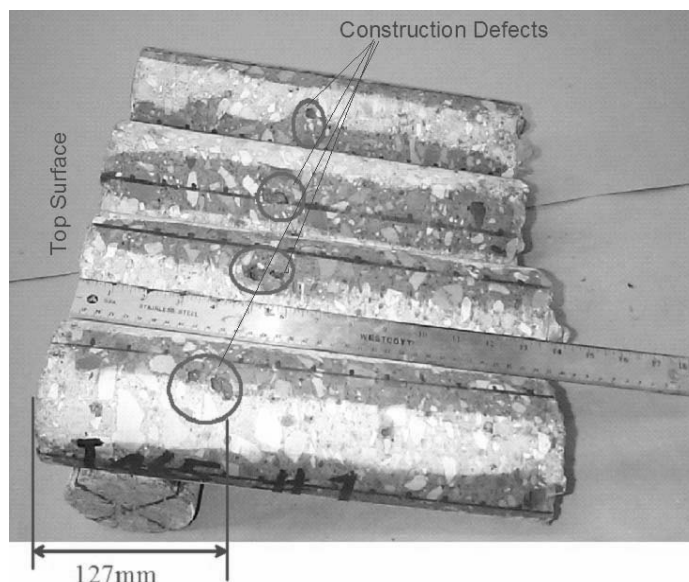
Photograph showing construction defects below surface of an I-465 pavement section
